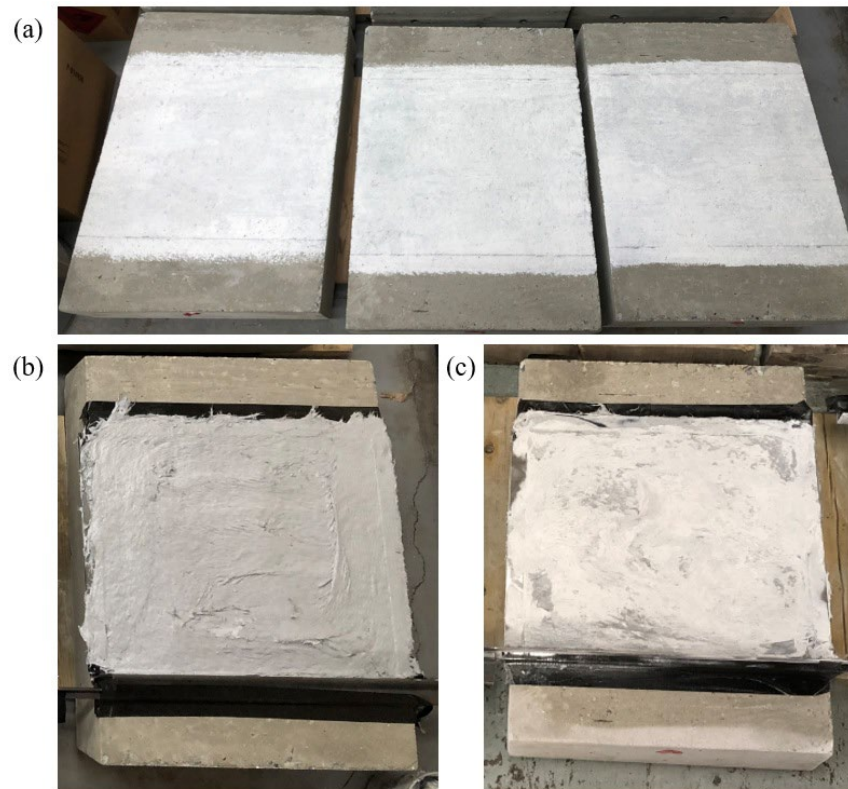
Intumescent paint (IP) application: (a) dilute sealant layer, (b) dried IP with 5 mm (0.20 in.) thick screed rails at top and bottom of the heated face, and (c) the final surface finish after sanding
